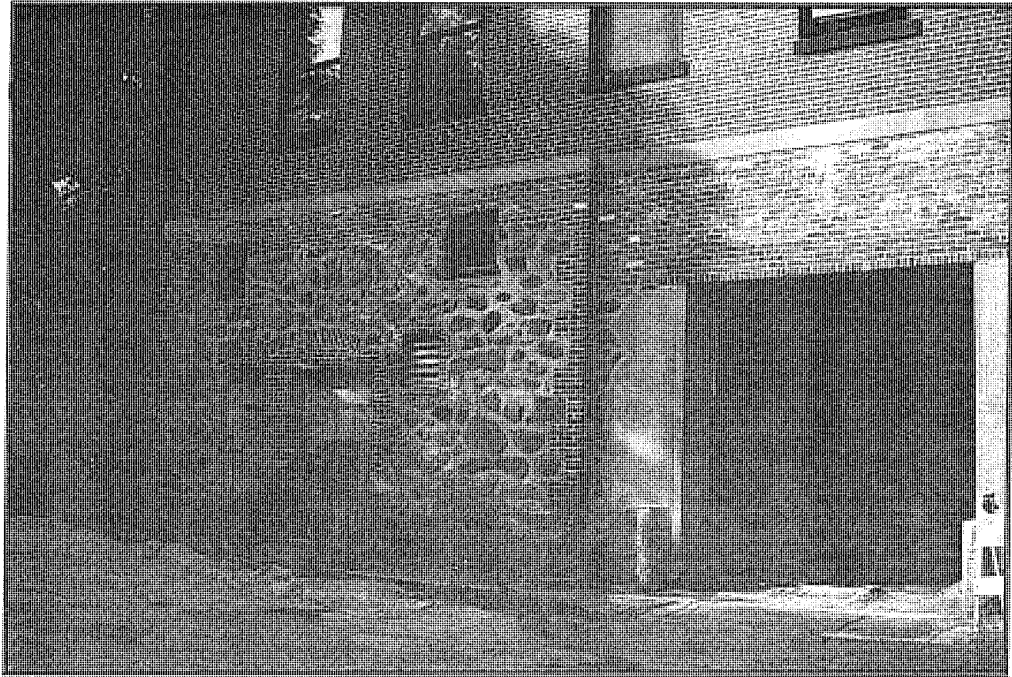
South (rear) wall of Belmont House and road salt in garage.
